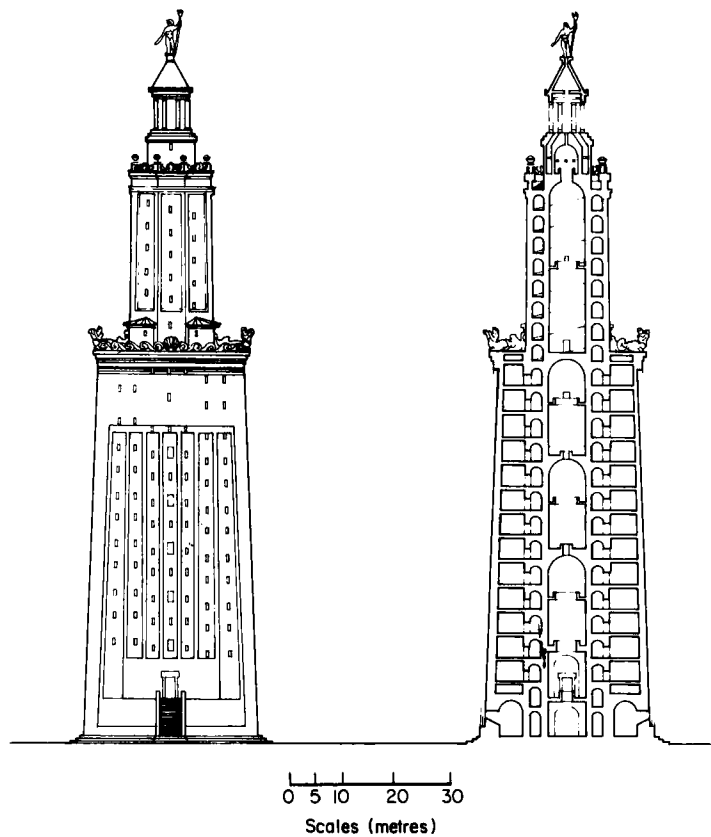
Elevation and section of Pharos after Thiersch (Agnew).
